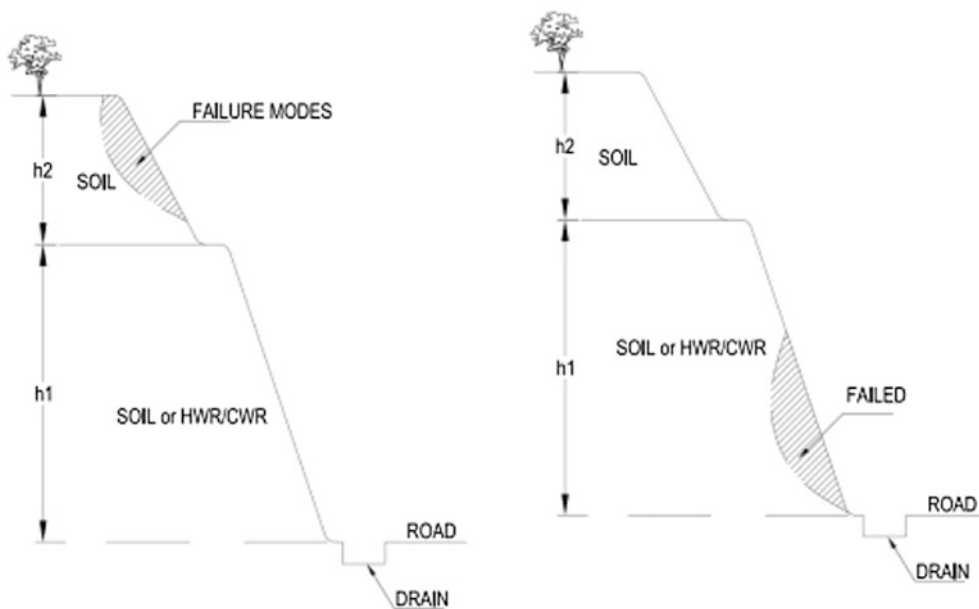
Typical observations of relatively circular modes of failure in high earth cuts with soil-rock site
